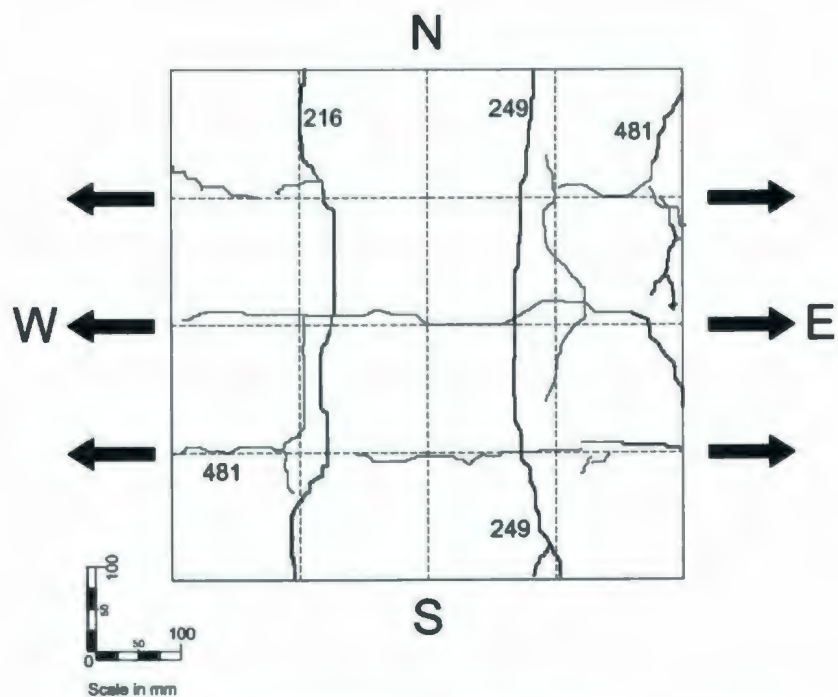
Stabilized crack pattern of panel P1-GNU-16-1.0-1.5
